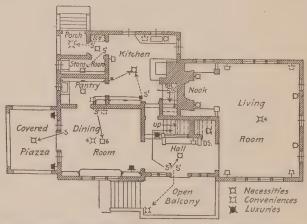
Typical wiring plan for first floor of residence showing outlets for lighting units and electrical devices.
